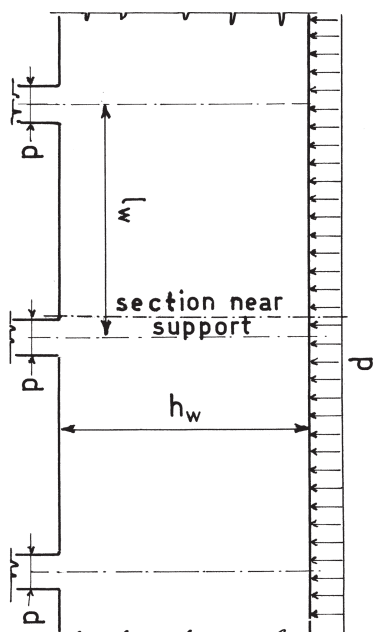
Continuous beam on many supports (notation and position of section considered).
